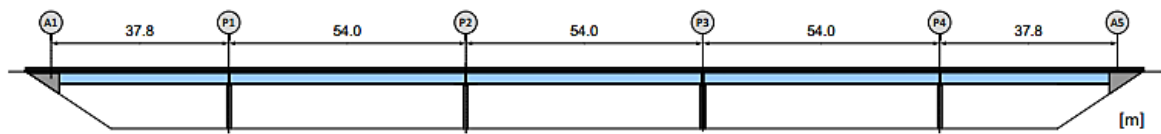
Span layout of the reference case study - bridge elevation [151]
